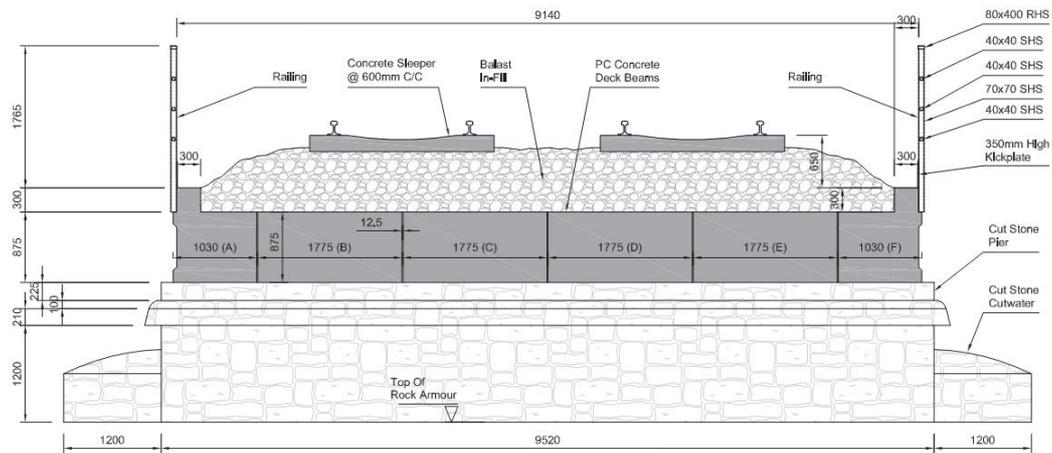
UBB30 Typical section for spans 2, 3 and 6 to 11
